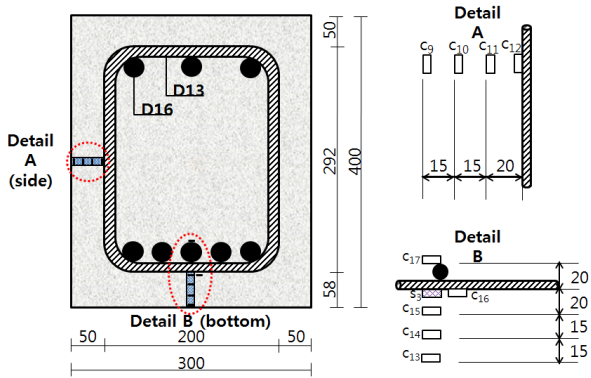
Cross section of RC beam with thermocouple details at 1/4 span(unit : mm)
